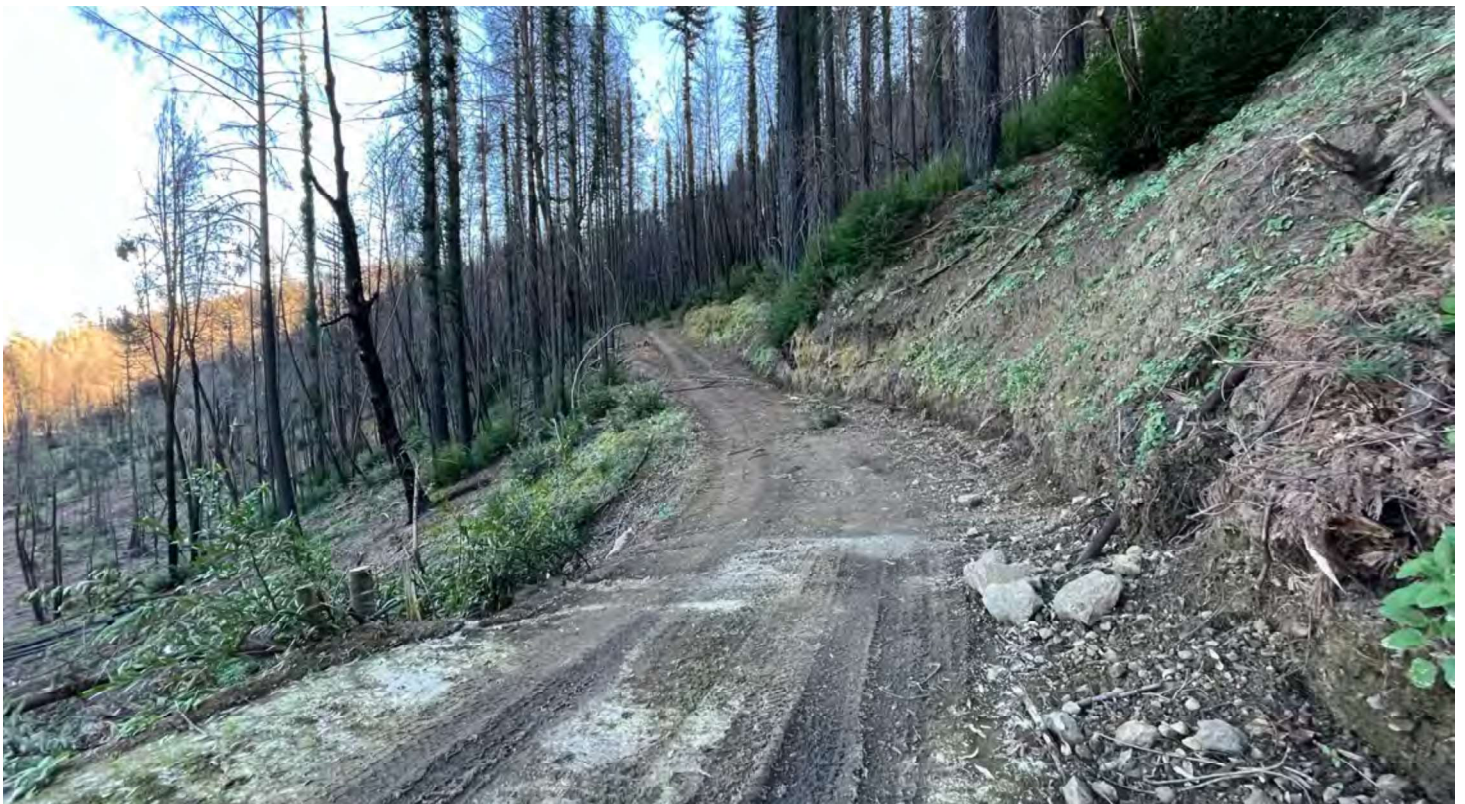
Adjacent Parcels Driveway looking North toward Sweetwater Springs Road
